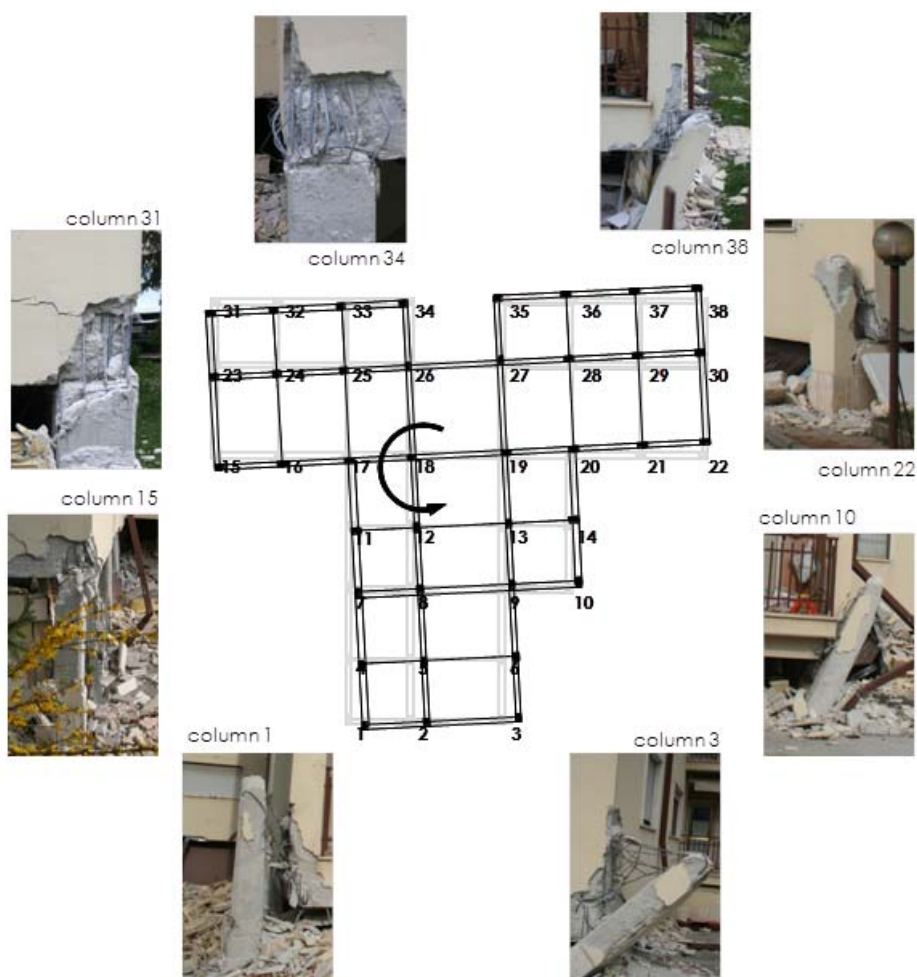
Building collapse: column damage points out a rotational movement.
